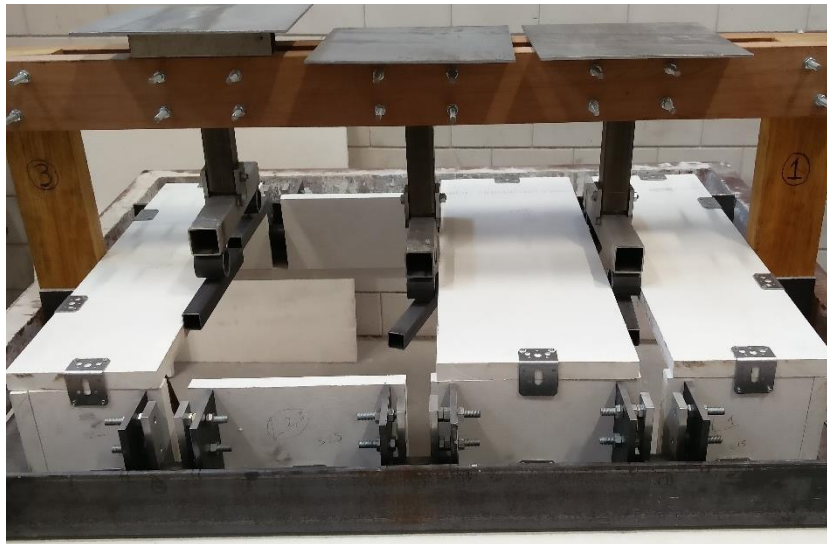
Placement of the top Promatect panels with room remaining for the beams
